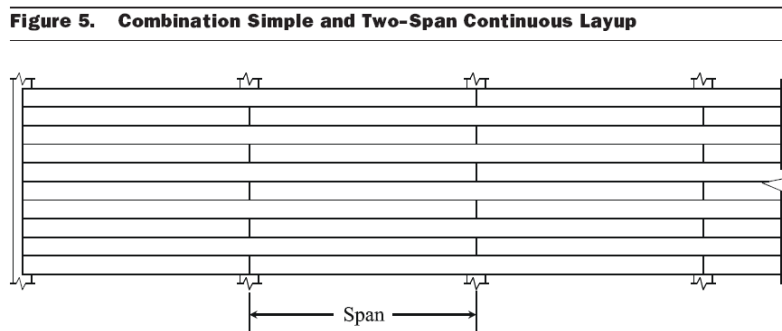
Combination Simple and Two-Span Continuous Layup (Image from WCD 2 – Tongue and Groove Roof Decking)
